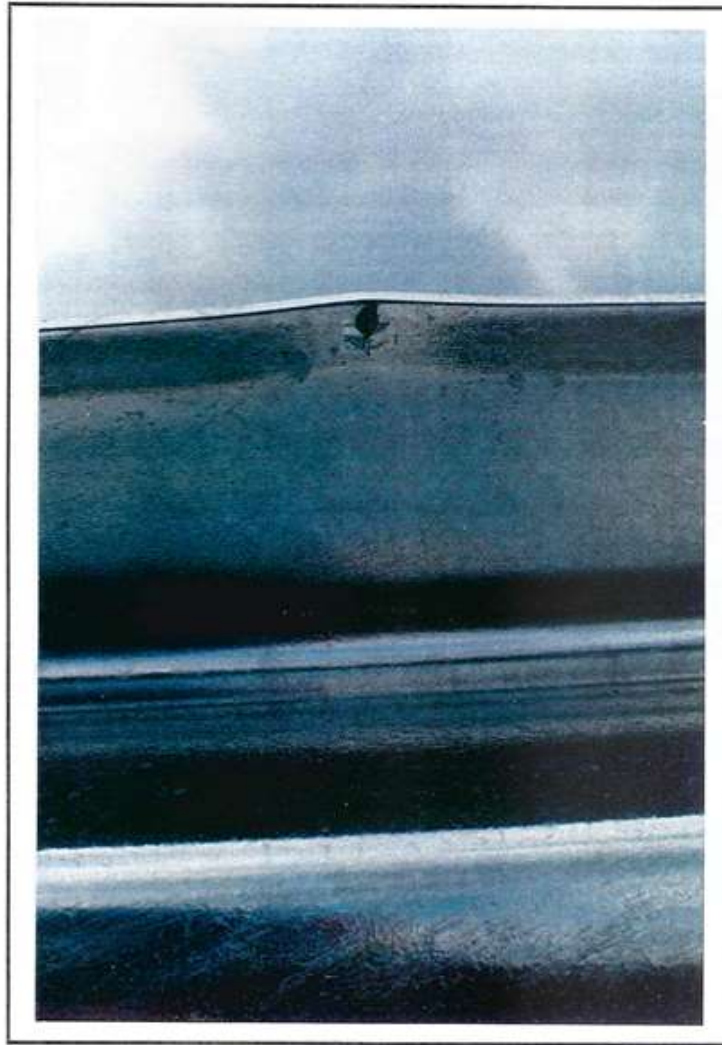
Condition:* Bent Rail (Cracked or Broken Galvanization)
